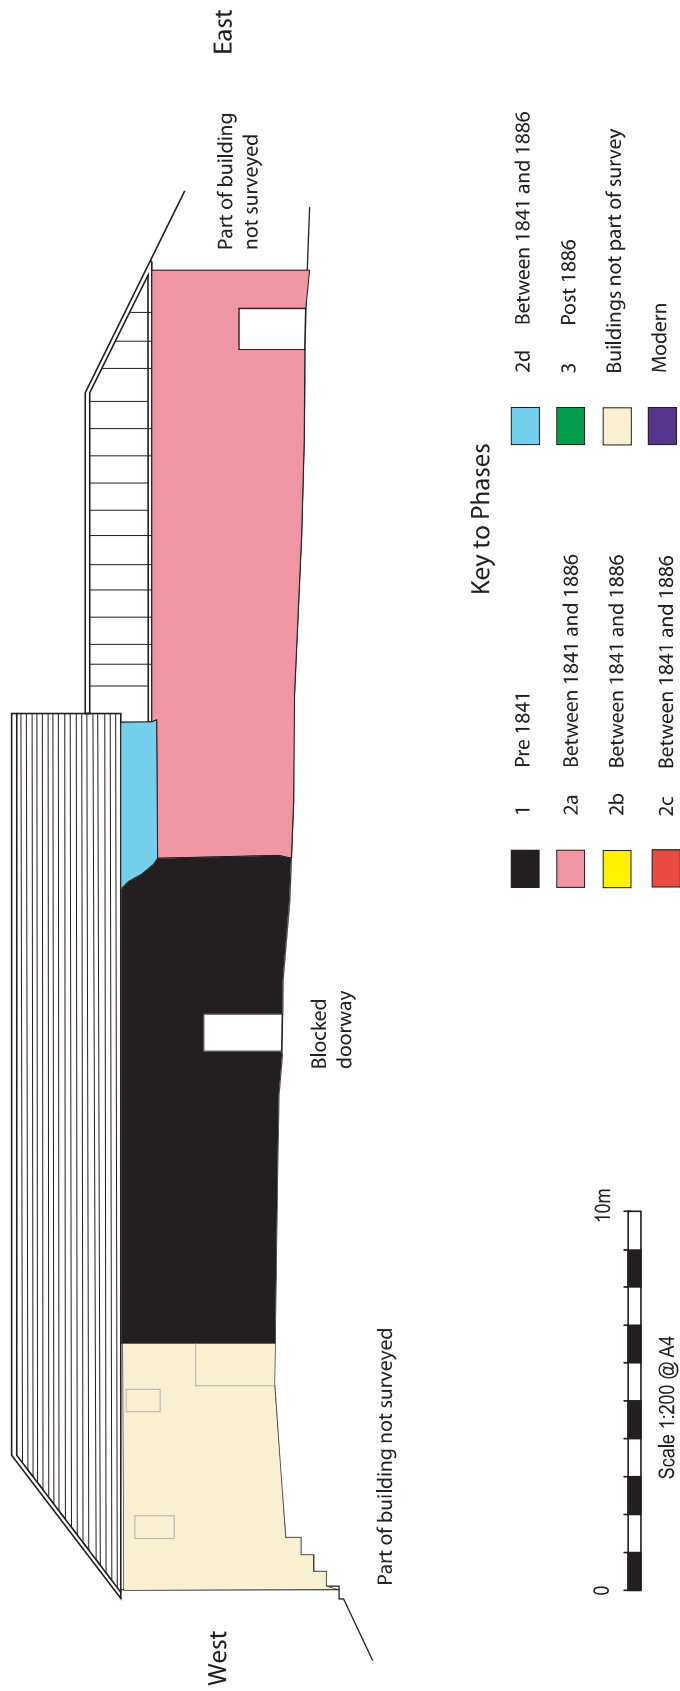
Knowle Farm outbuildings, the north facing elevation of the Stables and Milking Parlour showing building phasing.
